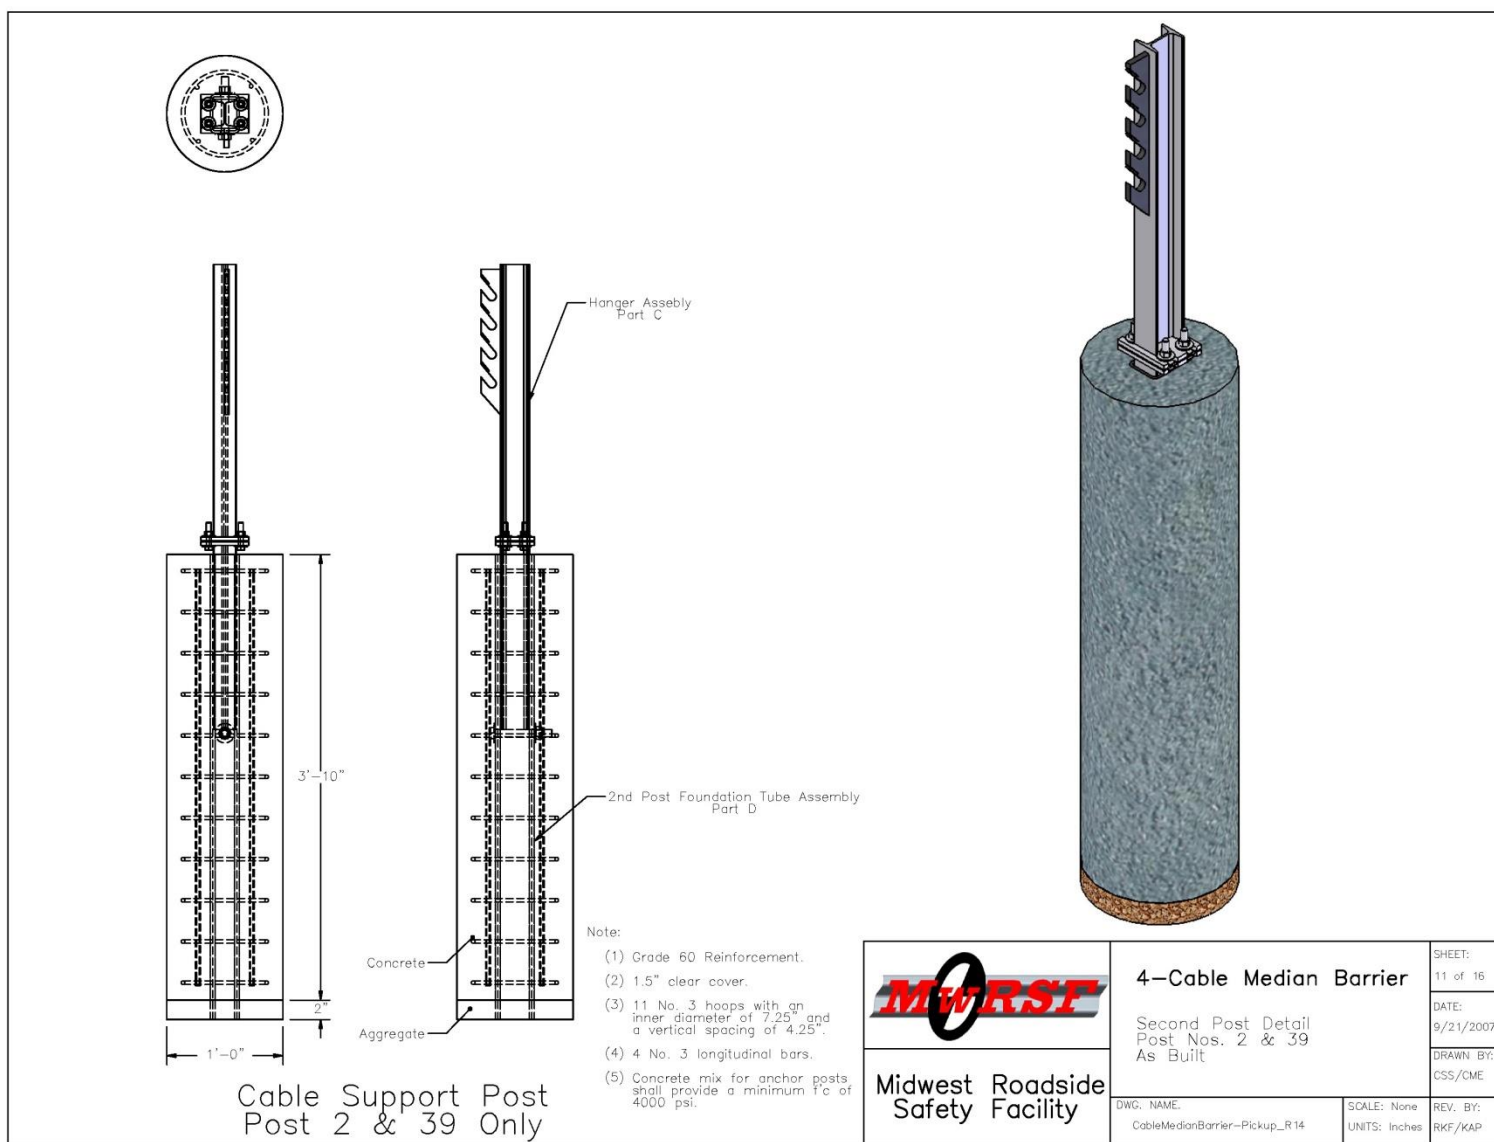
Cable Support Post Details, Test No. 4CMB-1, 2007 [66]
